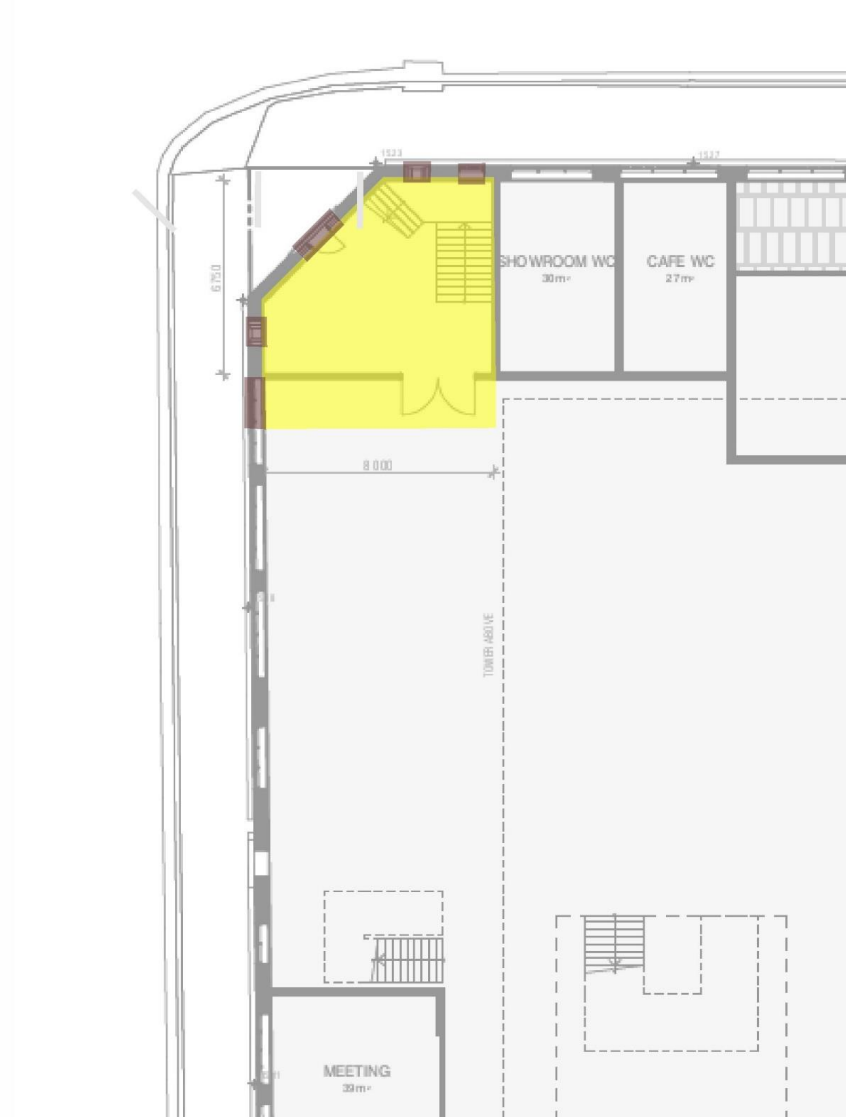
Treatment Scheme – Building A – Proposed Lobby
